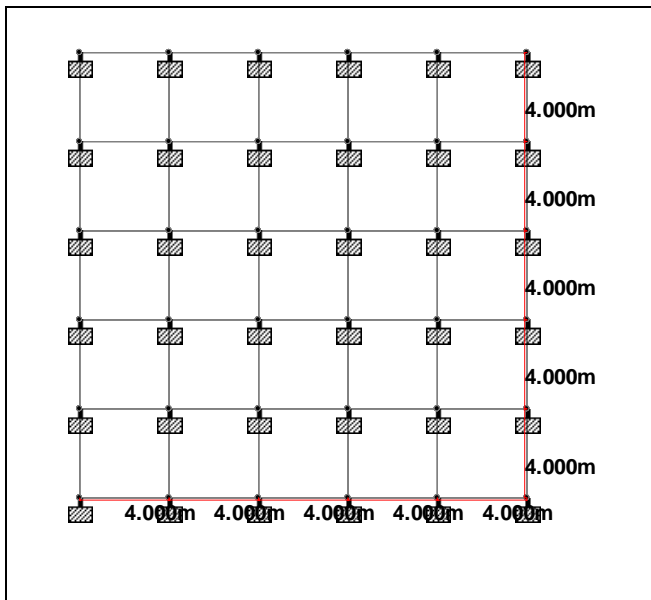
Plan Of G+5', G+10' & G+15 Model Without Shear Wall
